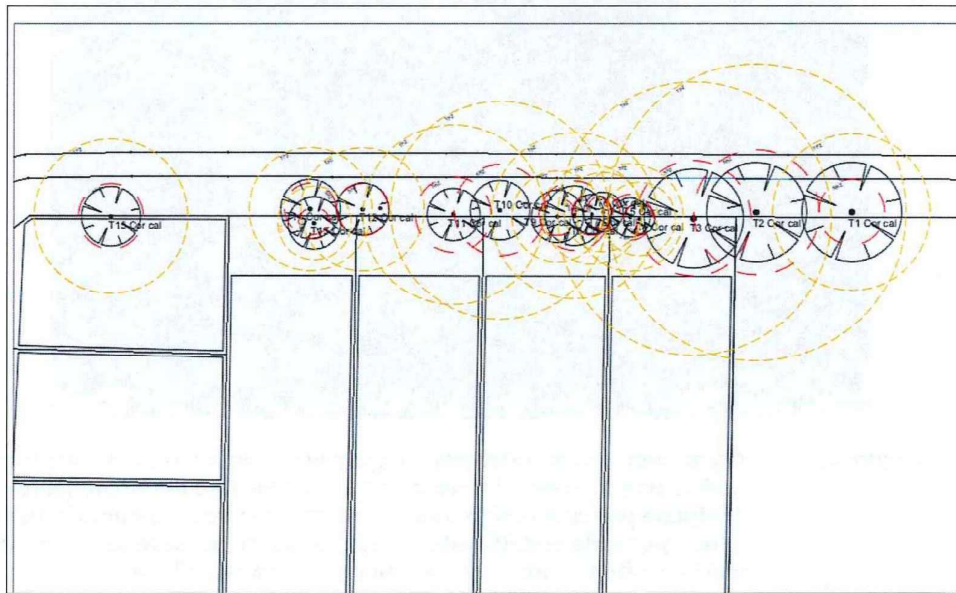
Tree protection plan with the tree numbering T1-15 allocated to the 15 trees assessed adjacent to the proposed construction.
